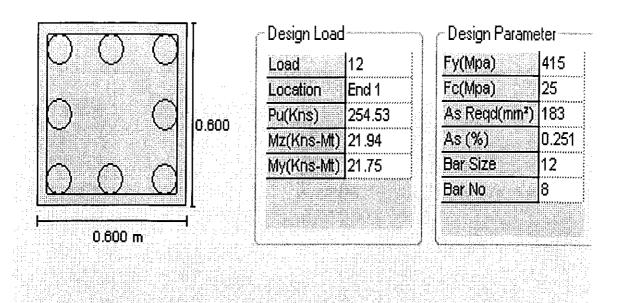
Detailing of the columns for the 7th and 8th storey in the above multi-storey building
